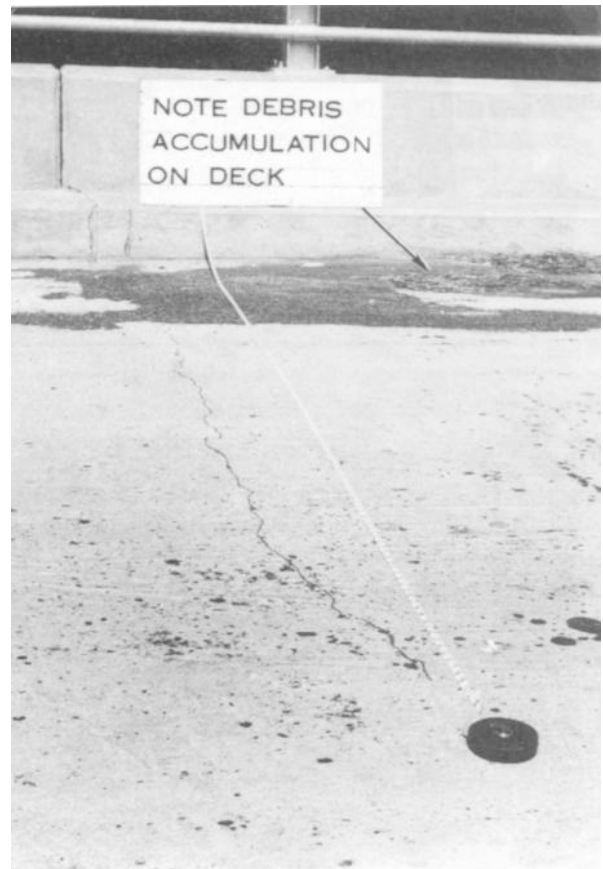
Debris accumulation on bridge deck indicating drainage problem.
